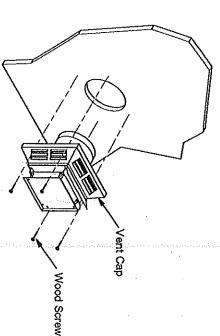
Installing Horizontal Vent Cap (Noncombustible Exterior)
